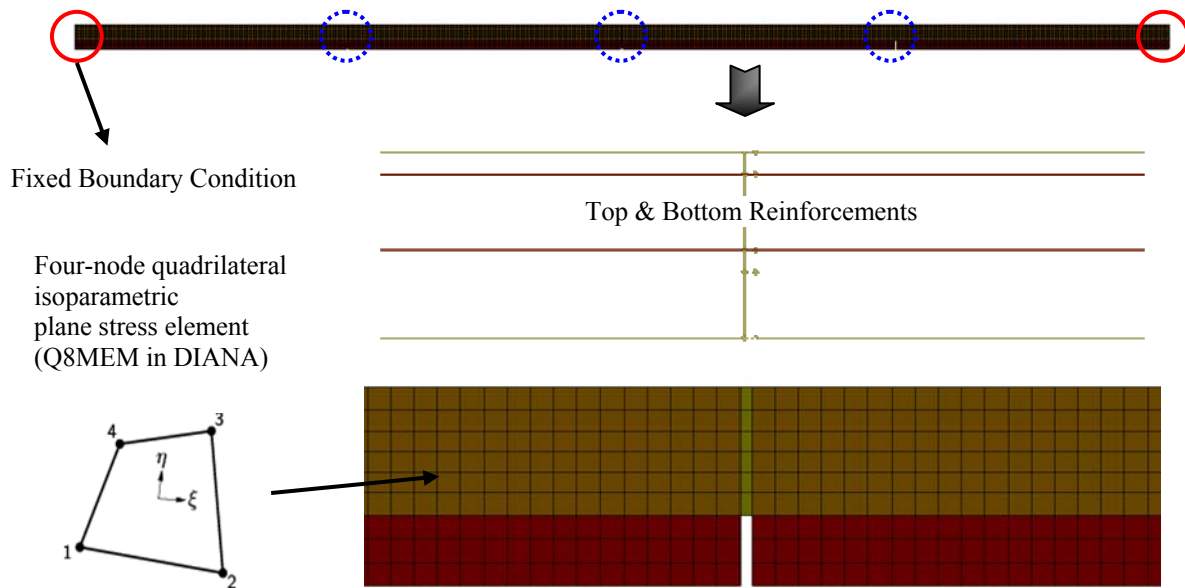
FE Models for Slab Deck with Modified CIP Reinforcement
